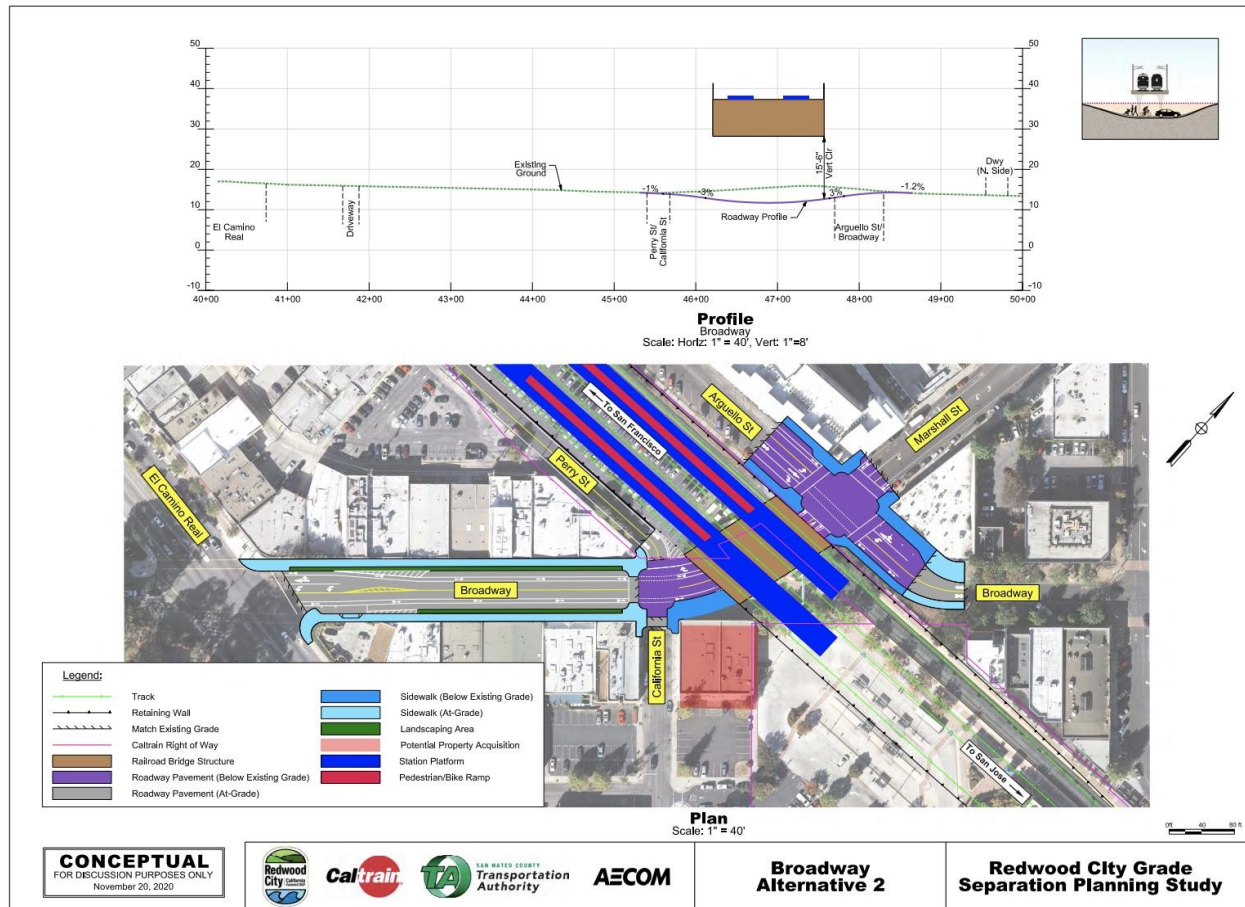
Changes to Broadway for Design Alternative 2 (Redwood City, 2020)
